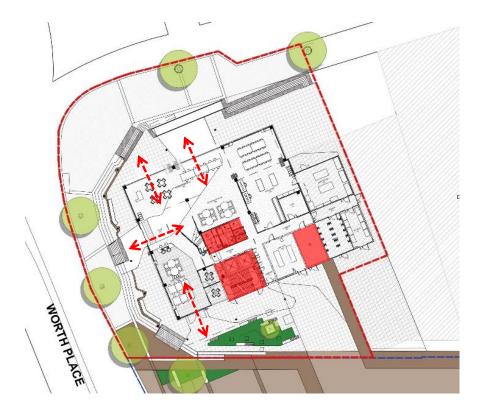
Primary internal / external connections of the Stage 1A Ground Floor
